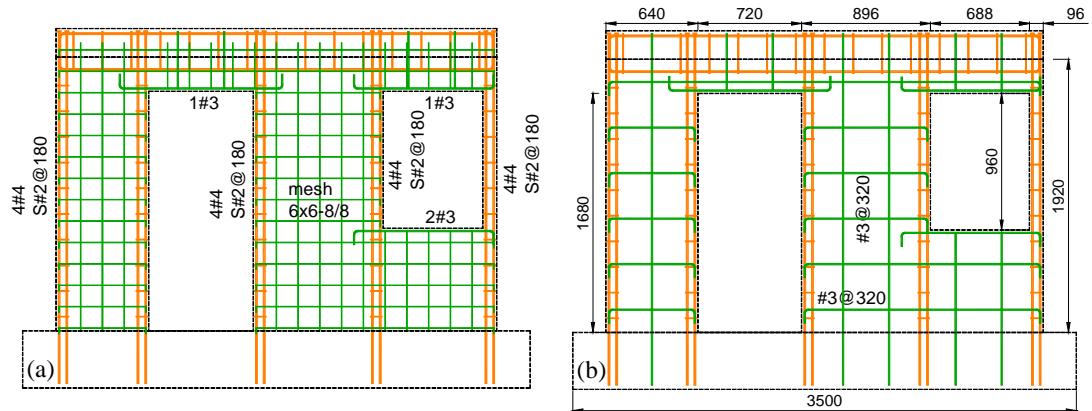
Geometry (mm) and reinforcement layout of models: a) MVN50m0D, b) MVN100D.
